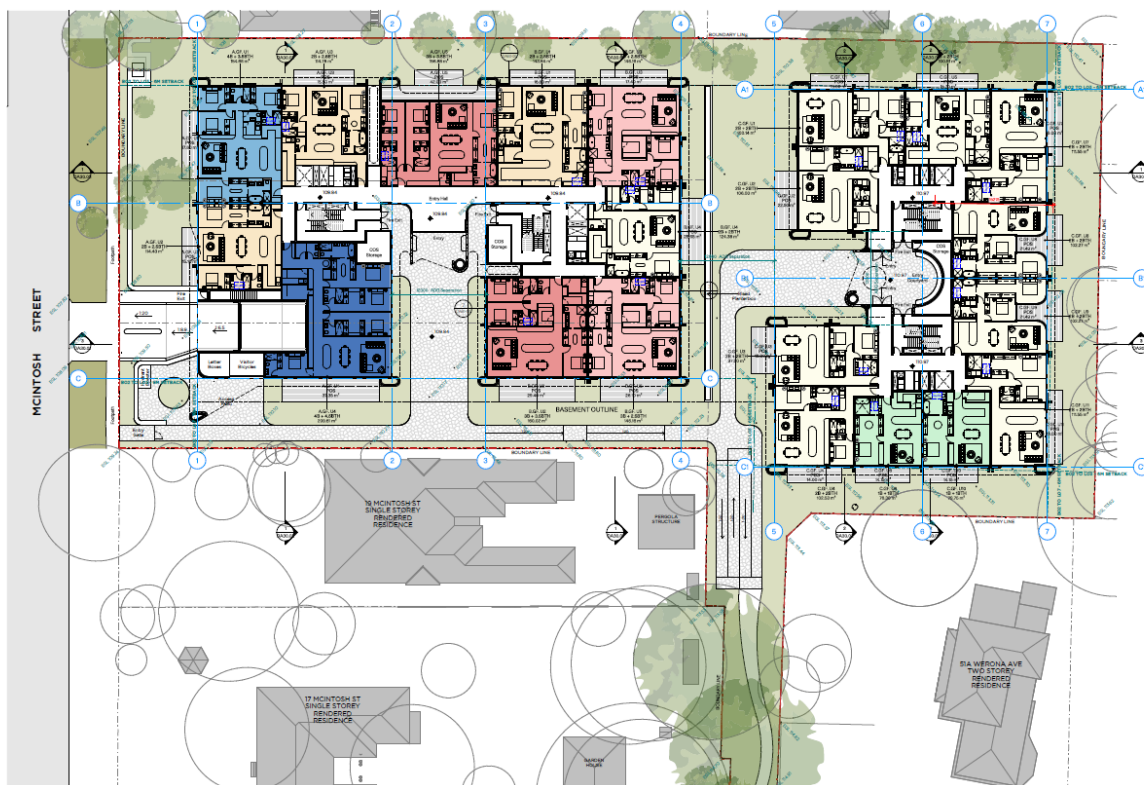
Extract of the site plan showing a greater separation between the subject site and 19 McIntosh Street.
